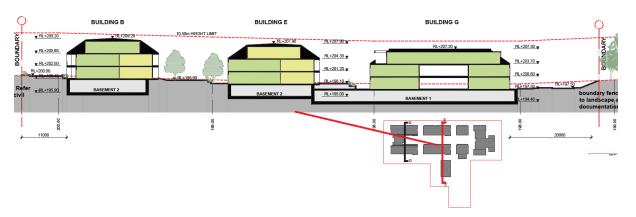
Section of the proposed development, looking from the centre of the site towards Vineys Road.
